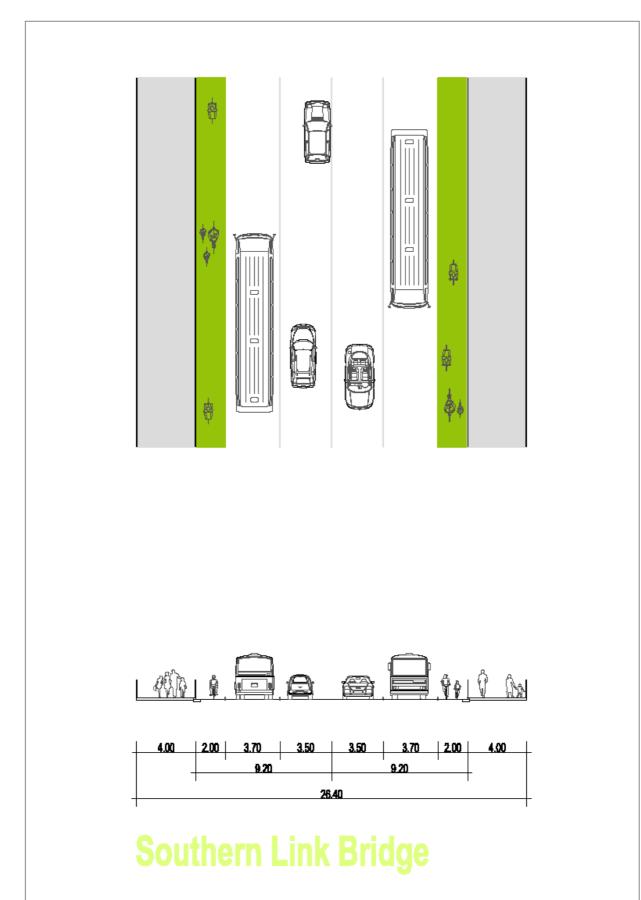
(a) Sub-arterial Road Type A Typical Cross Section
